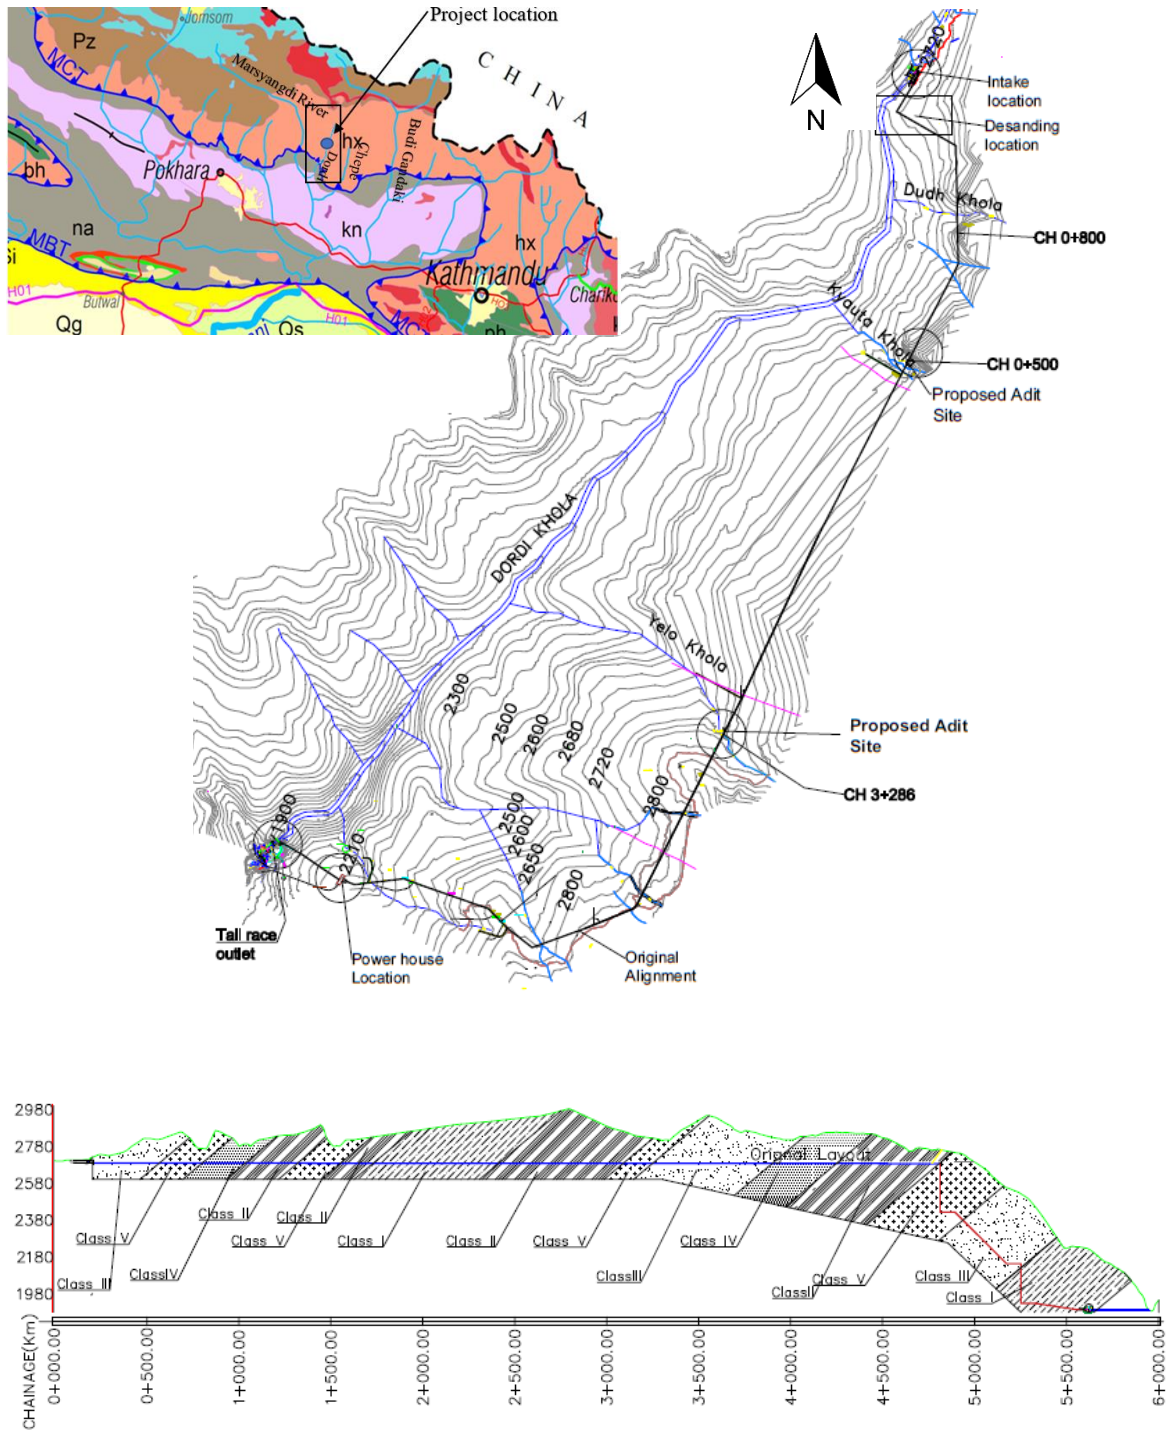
Original layout with geological location (top left corner) and a section view (down) for Himchuli-Dordi HPP
